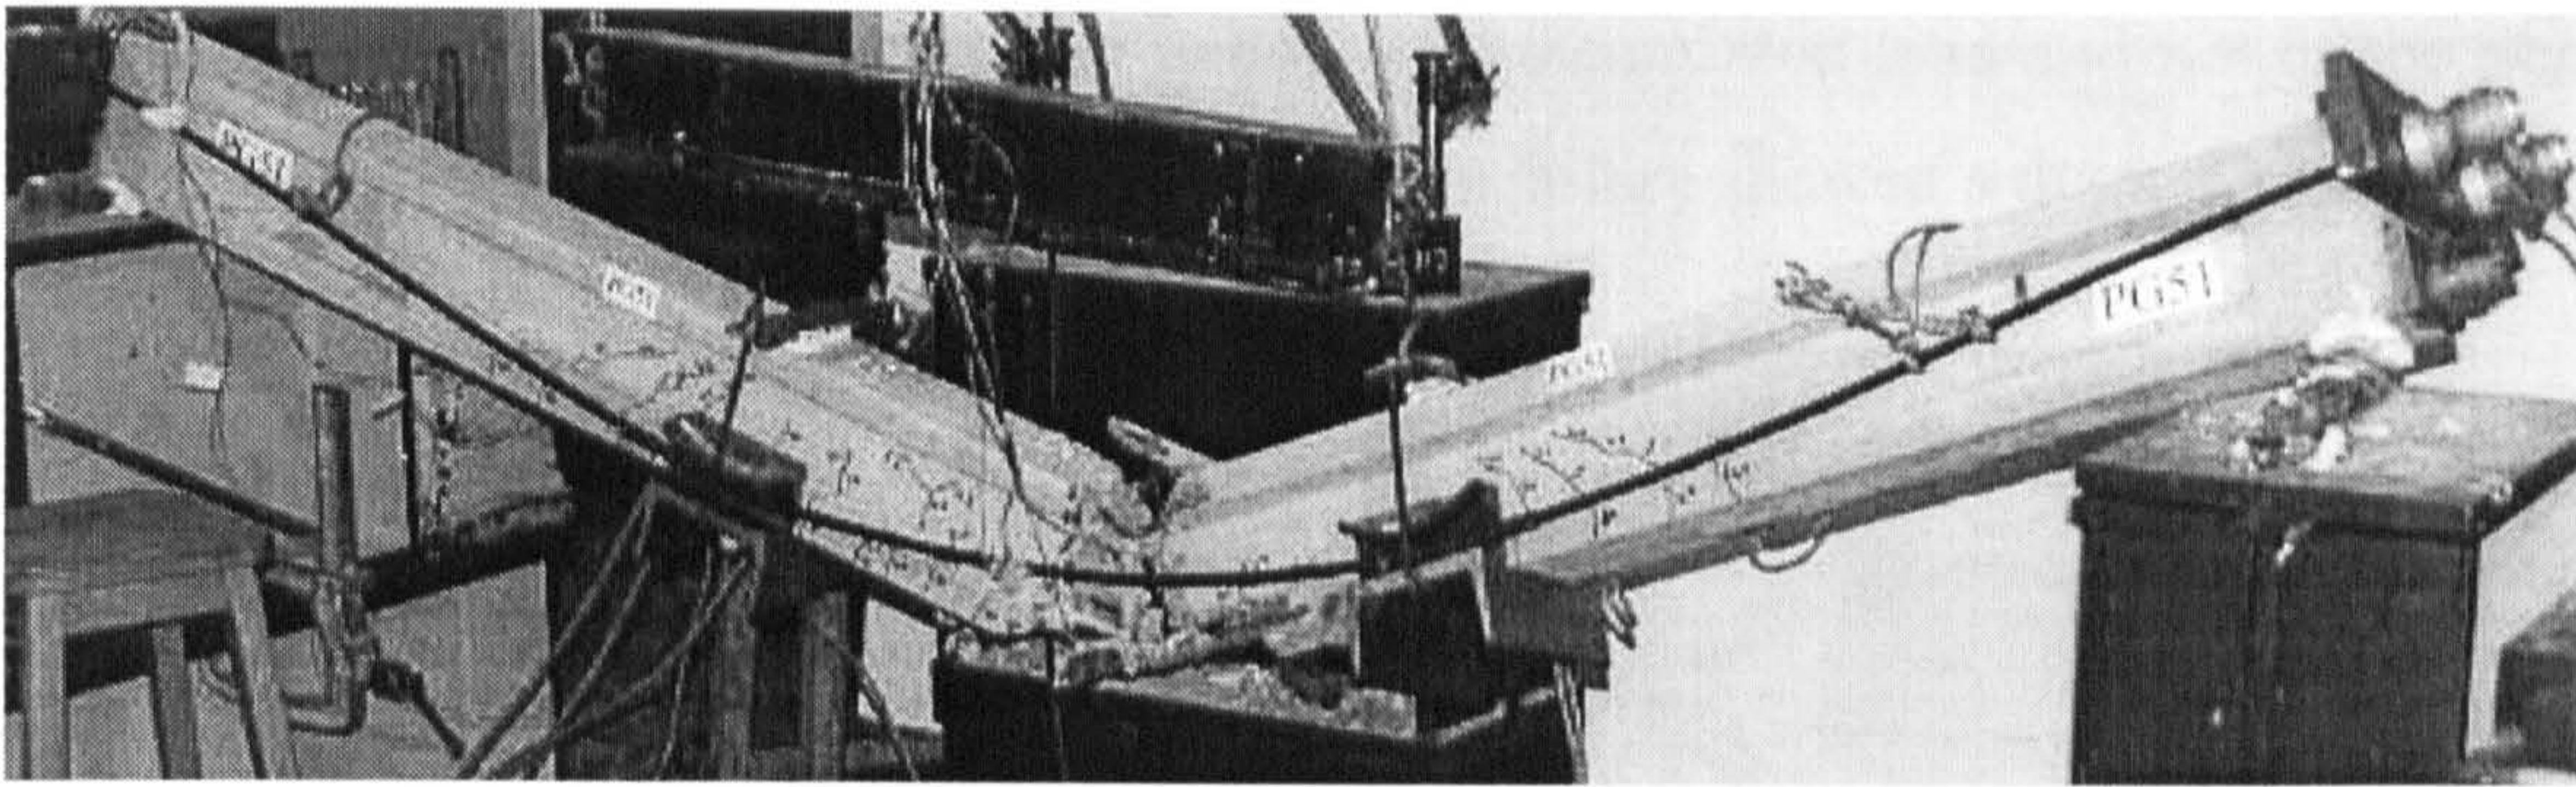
Typical flexural failure of external prestressed beam
